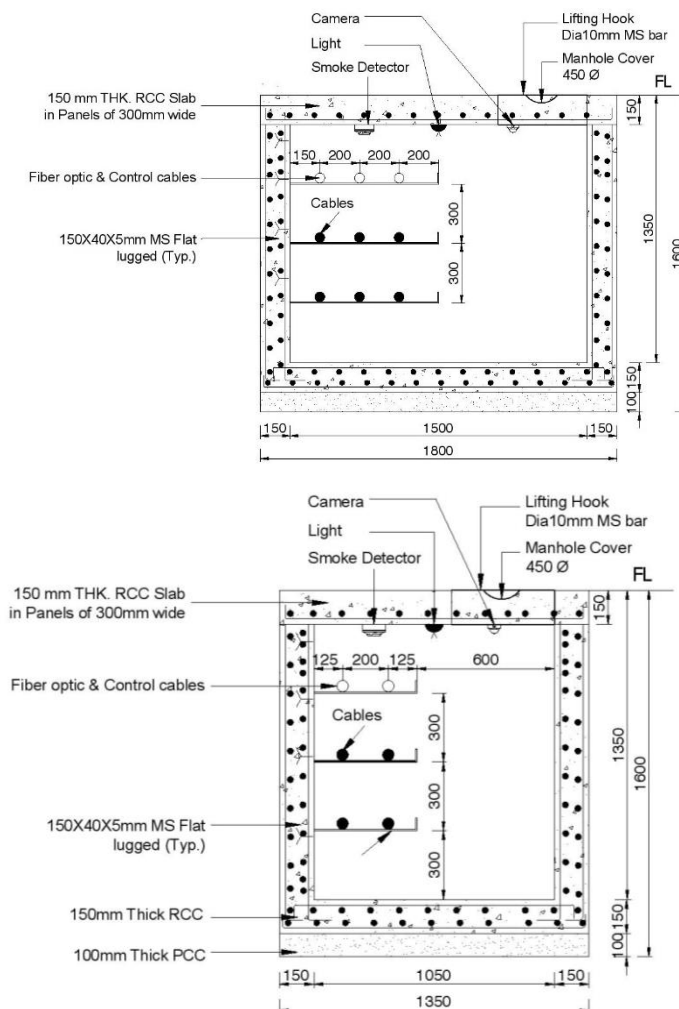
TYPICAL SECTION FOR CABLE TRENCH
